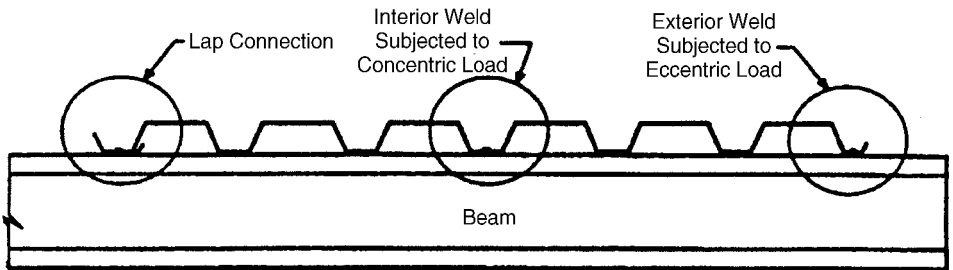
Interior weld, exterior weld, and lap connection.
